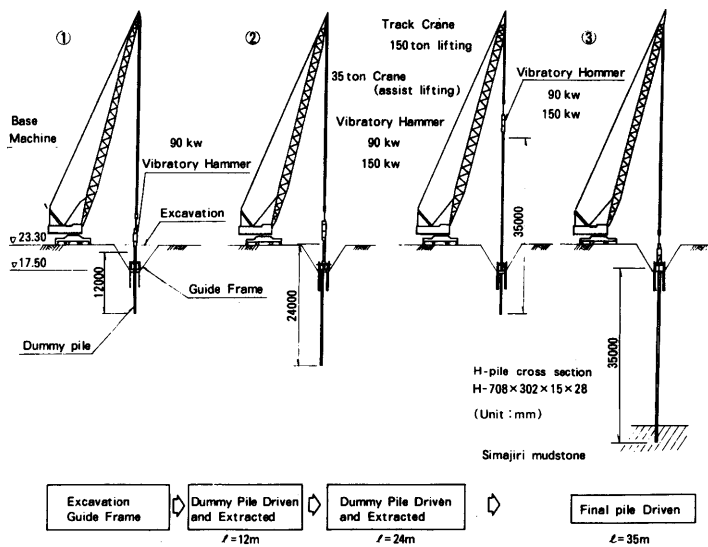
Constructions sequence of cutoff wall by the steel sheet piling method.
